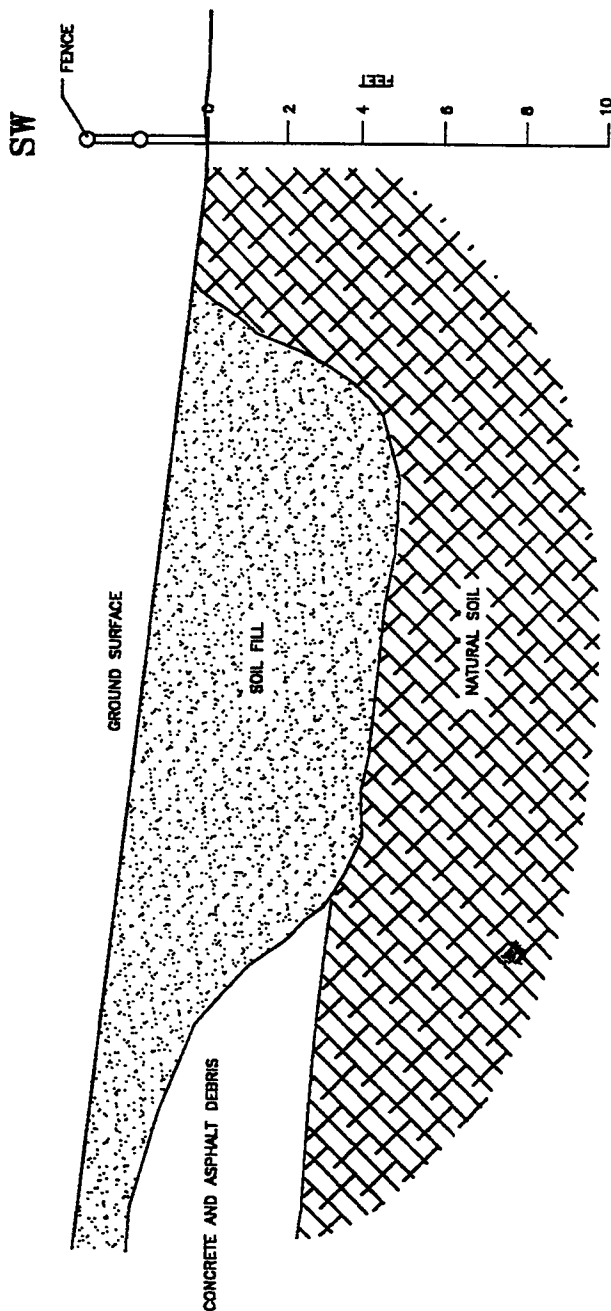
FIGURE:		LANDFILL INVESTIGATION TEST PIT CROSS SECTION TEST PIT 3 LAURENS CERAMICS SITE LAURENS, SOUTH CAROLINA
